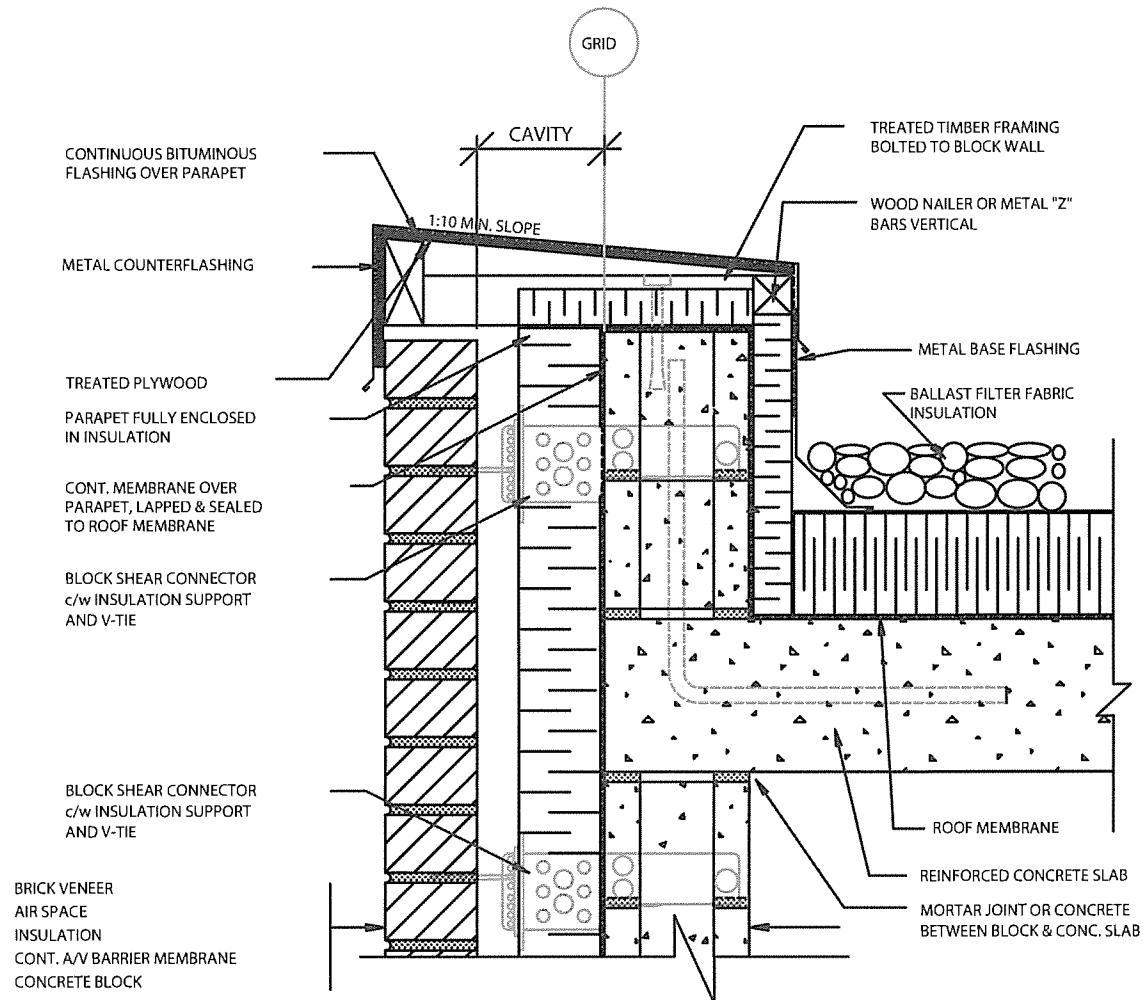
BRICK VENEER/CONCRETE BLOCK-DETAIL OF LOW PARAPET W/
